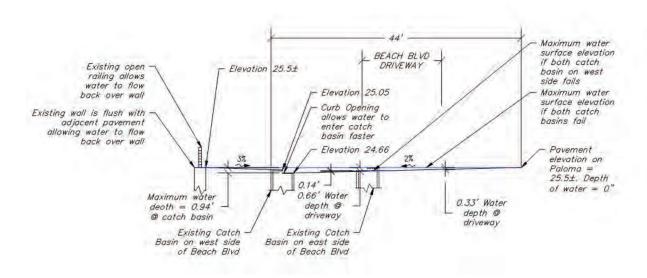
Cross section through Paloma Avenue/Beach Boulevard Intersection.
